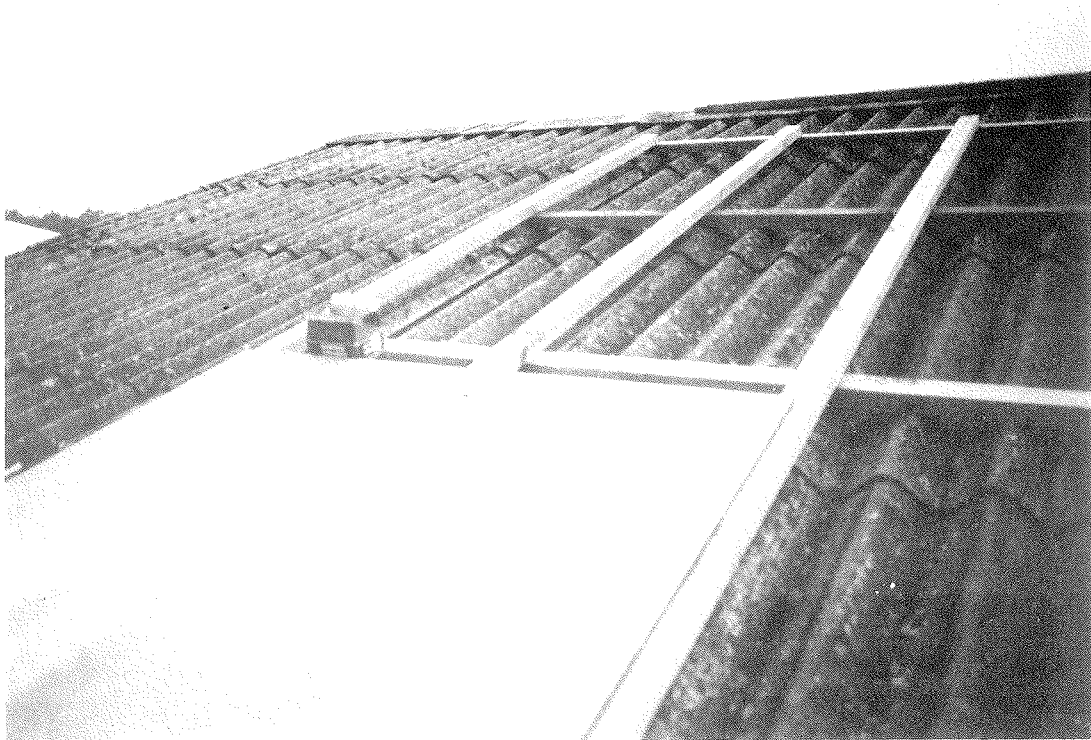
The backside protection of the MF-panel made of chipboards mounted on the wooden skeleton.
